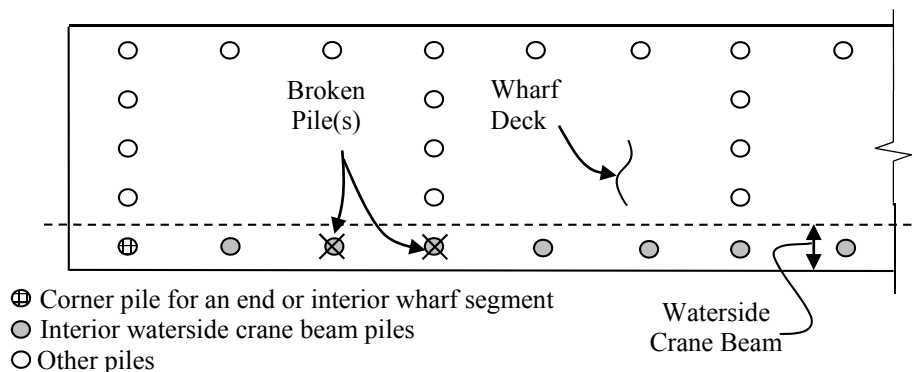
Waterside Crane Beam Broken Piles Layout
